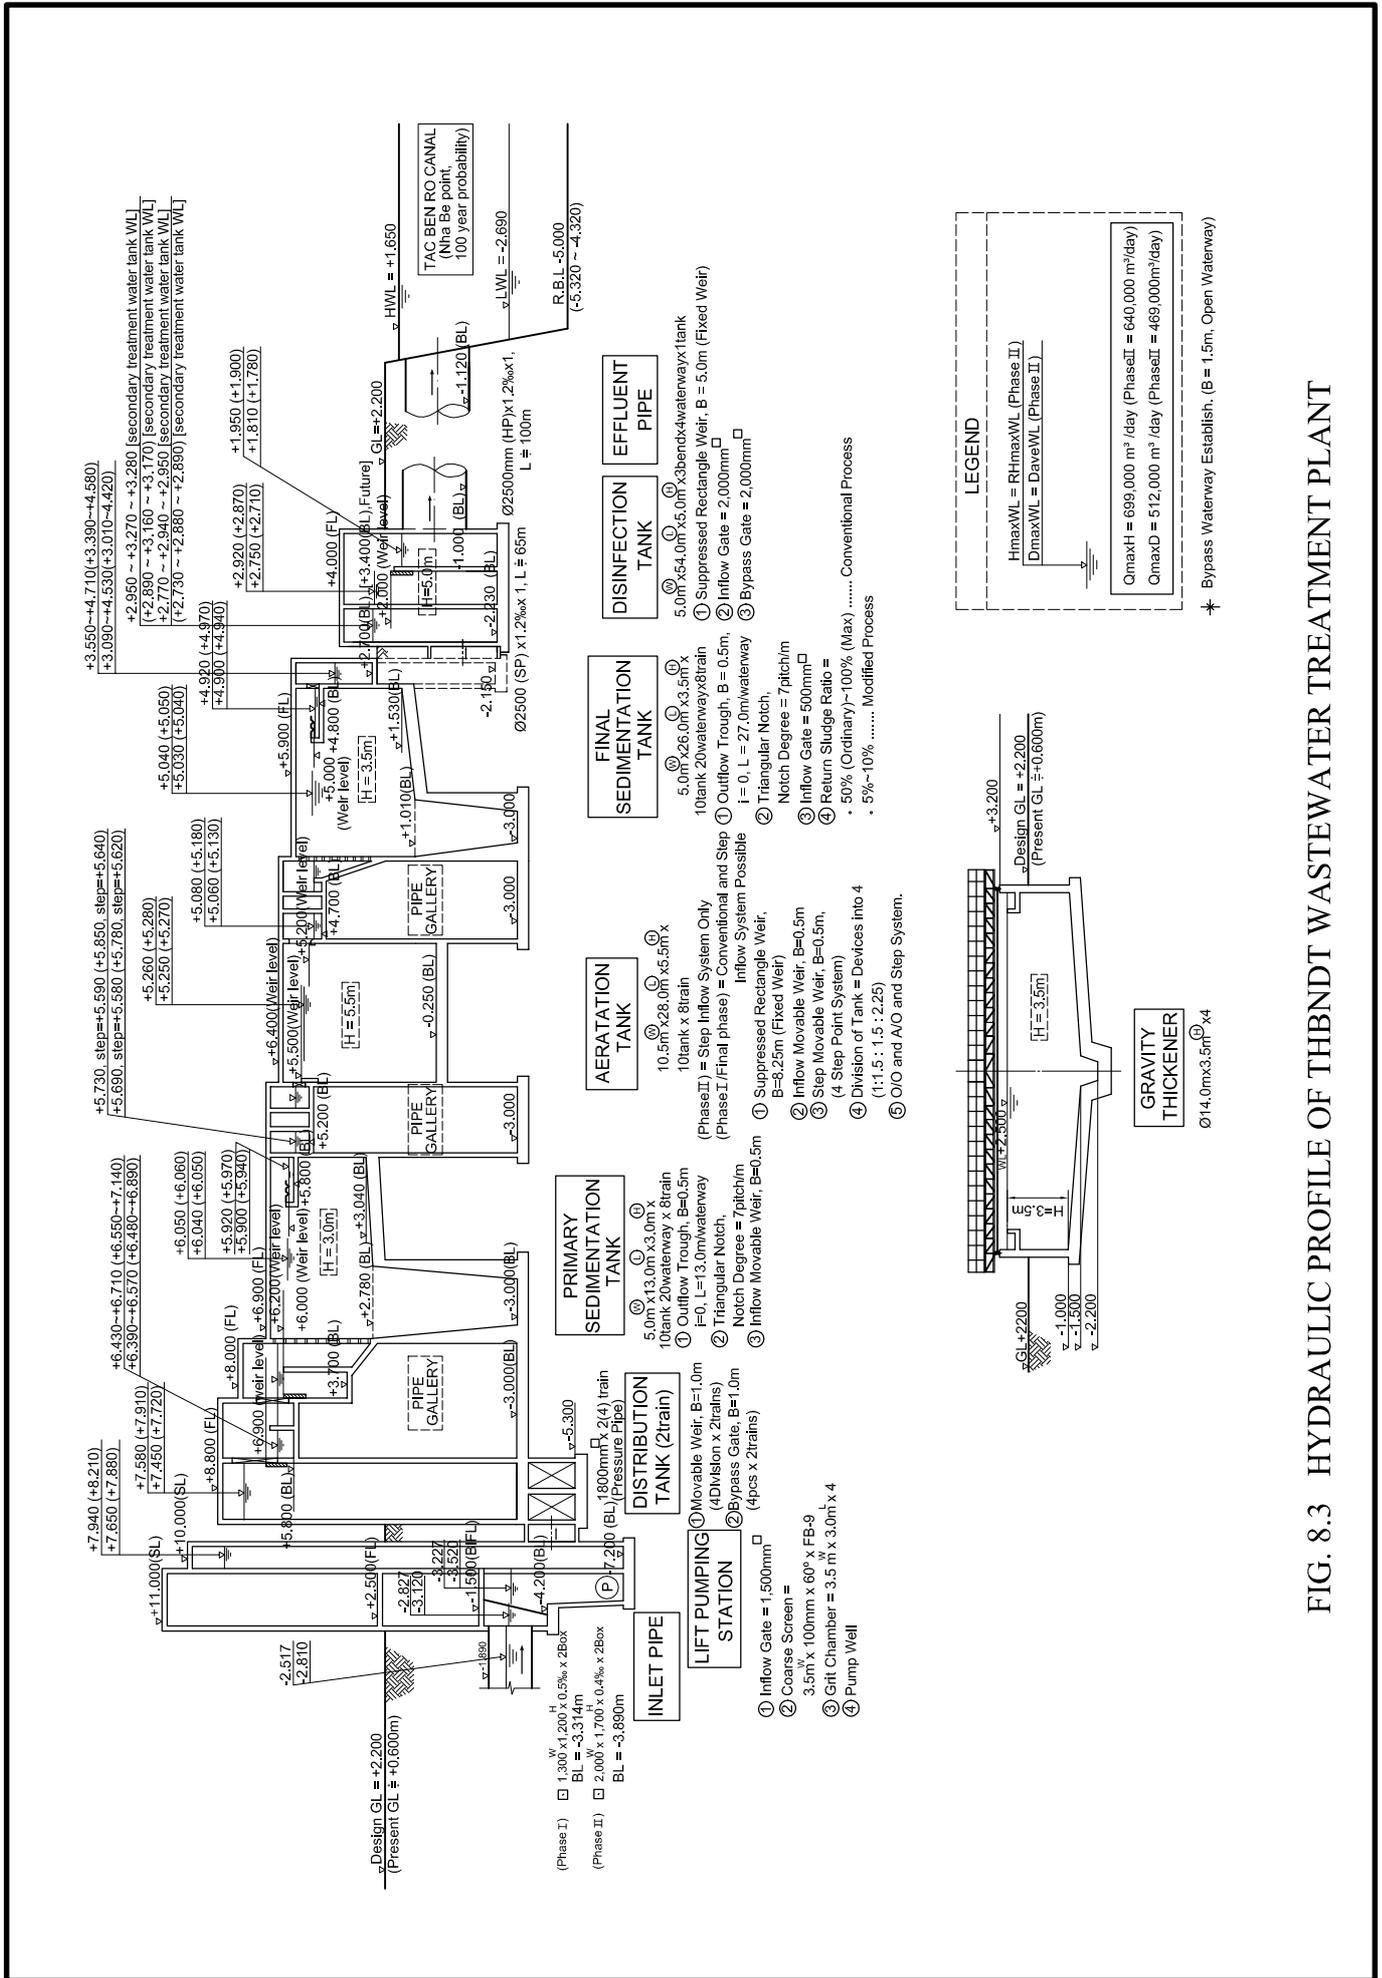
HYDRAULIC PROFILE OF TBNDT WASTEWATER TREATMENT PLANT
